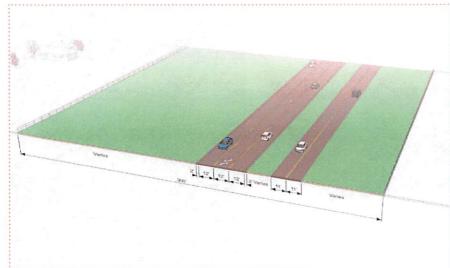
Existing Cross-section, US 30 from Saddle Ridge Tr. to Christensen Rd.
